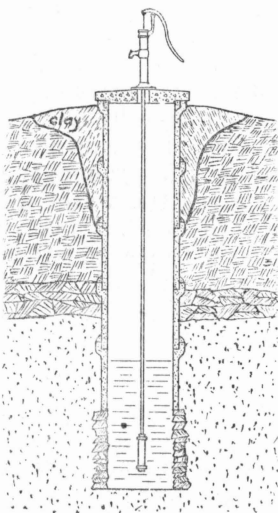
A well curb of concrete or clay tile with cemented joints.
